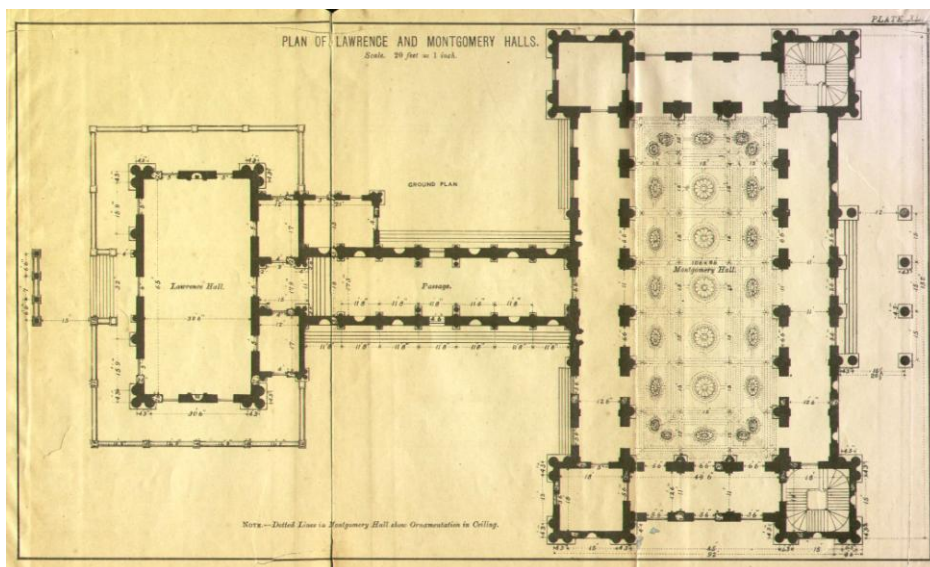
Plan of Lawrence Hall (left) and Montgomery Hall (Rt) in 1877. Halls were connected through a corridor
